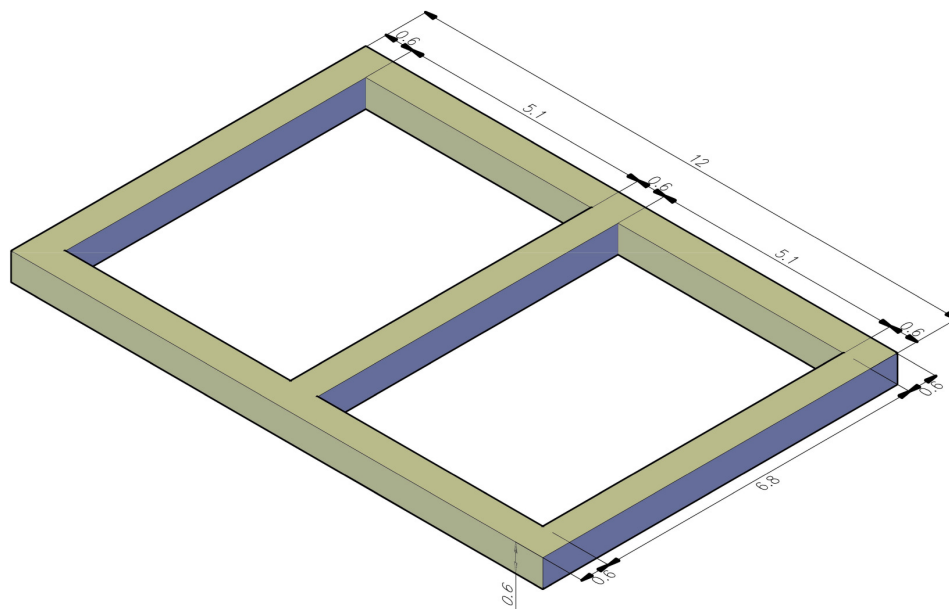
Raft footing case study: 3D view of foundation geometry.
